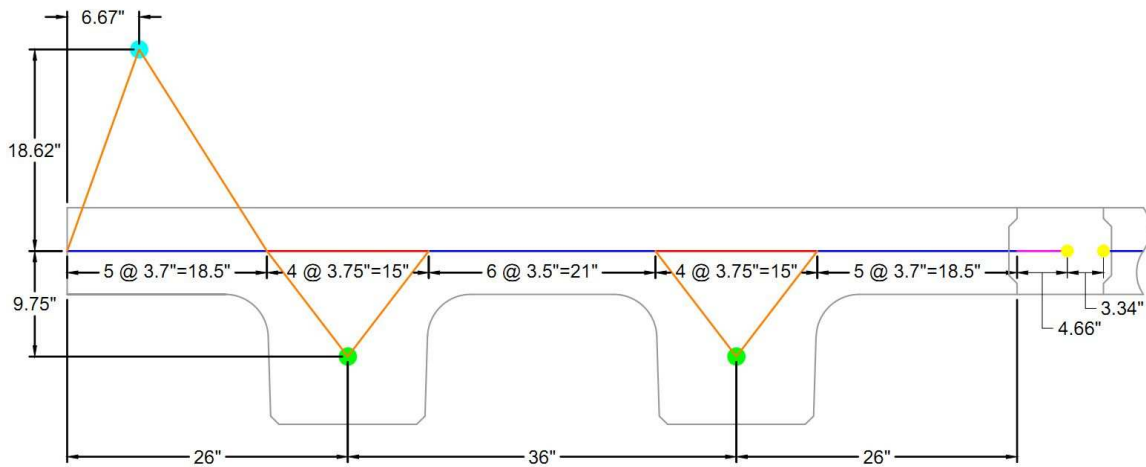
Shell modeling layout for eight-foot NEXT-D section
